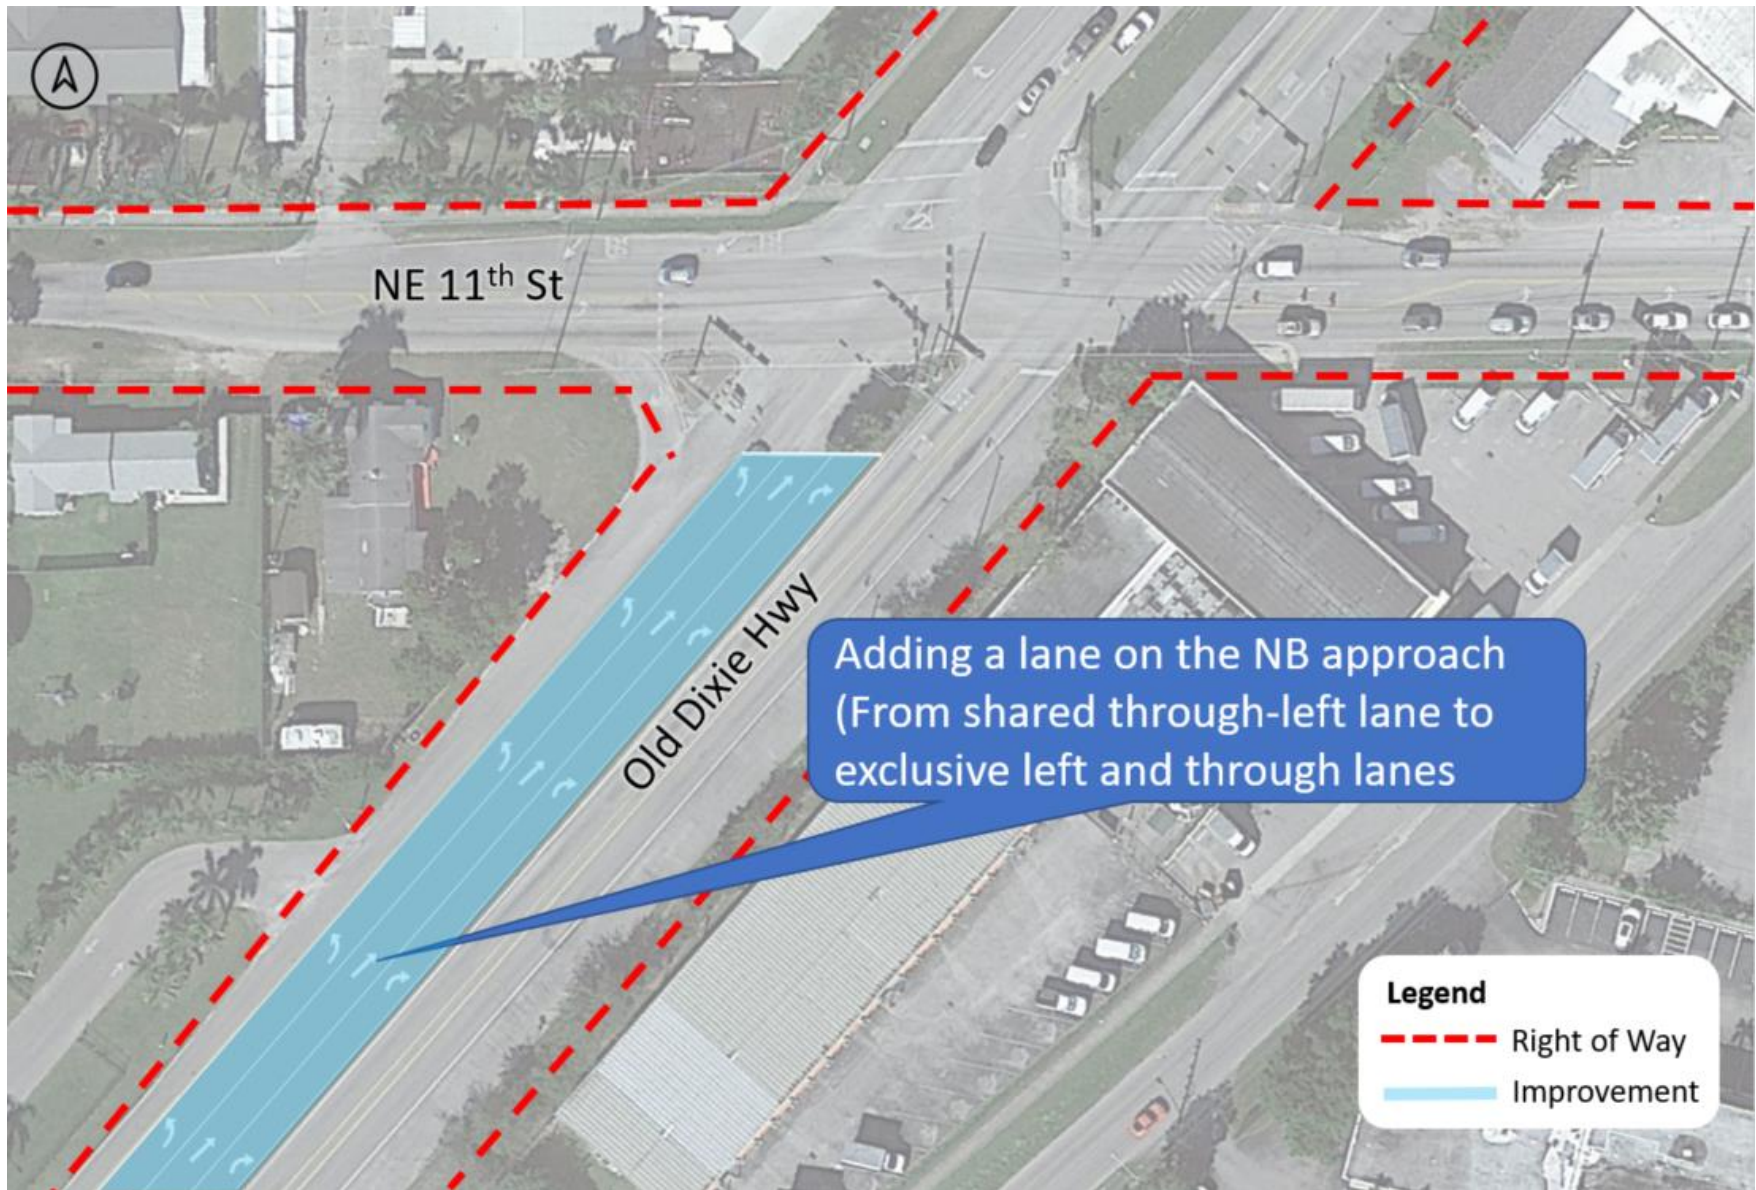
Conceptual Design Plan – Old Dixie Highway and NE 11th Street
